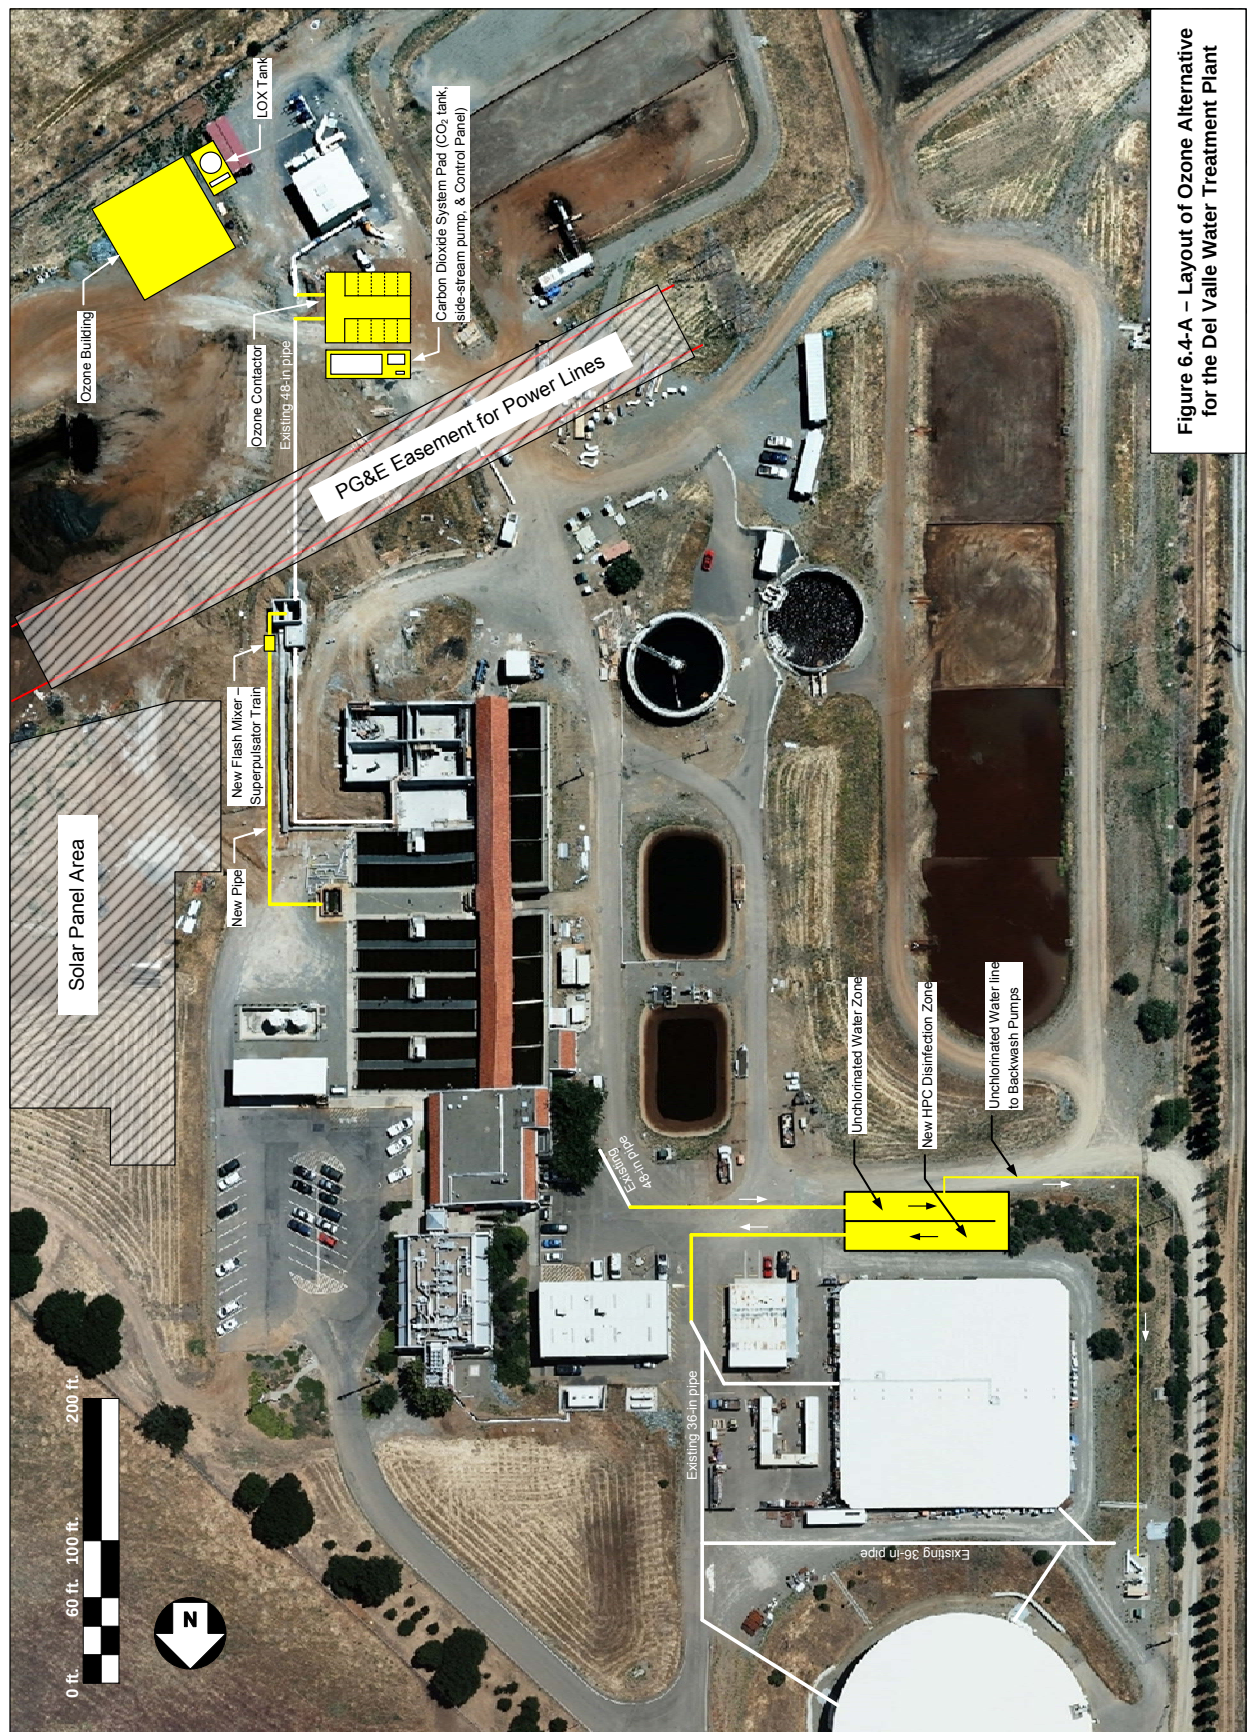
A – Layout of Ozone Alternative for the Del Valle Water Treatment Plant
